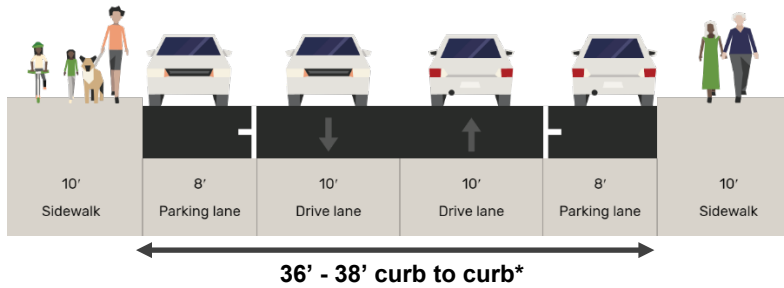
Section B (Butler Street – Sawyer Street to 62nd Street) – Existing
